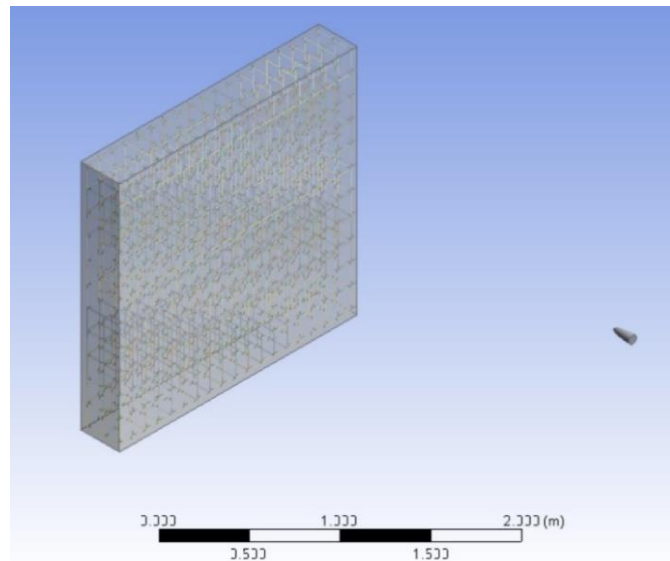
Reinforced Concrete Wall with Fragment due to 28.86 kg TNT Shaped Charge.
